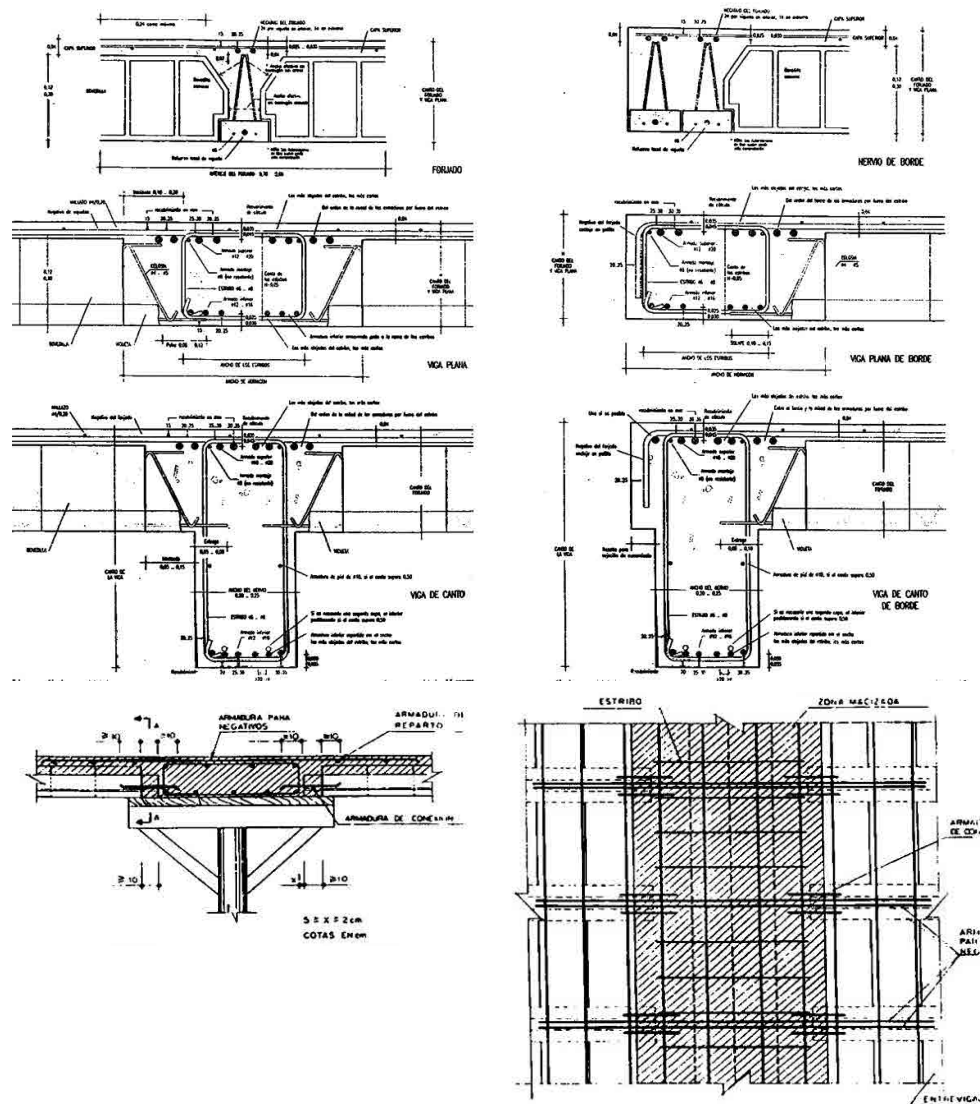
Reinforced Concrete Half-joists On Reinforced Concrete Flat Beam. In NTE (Normas Tecnológicas de la Edificación).
